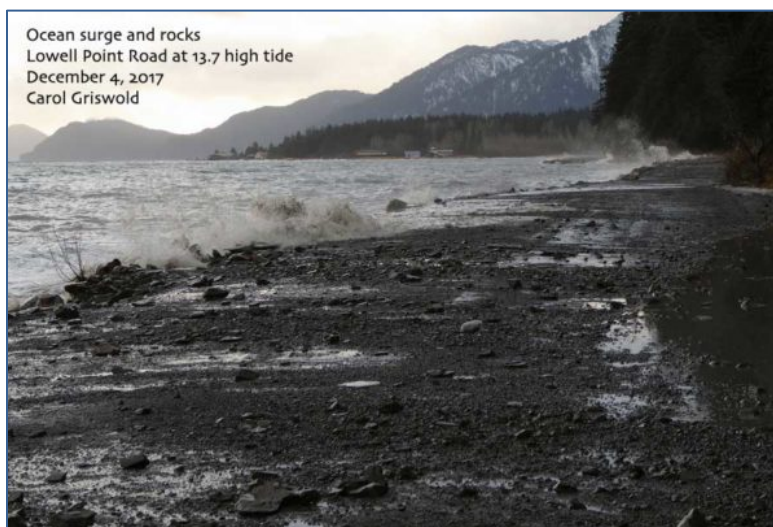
Seward's Storm Surge Flooding of Lowell Point Road
